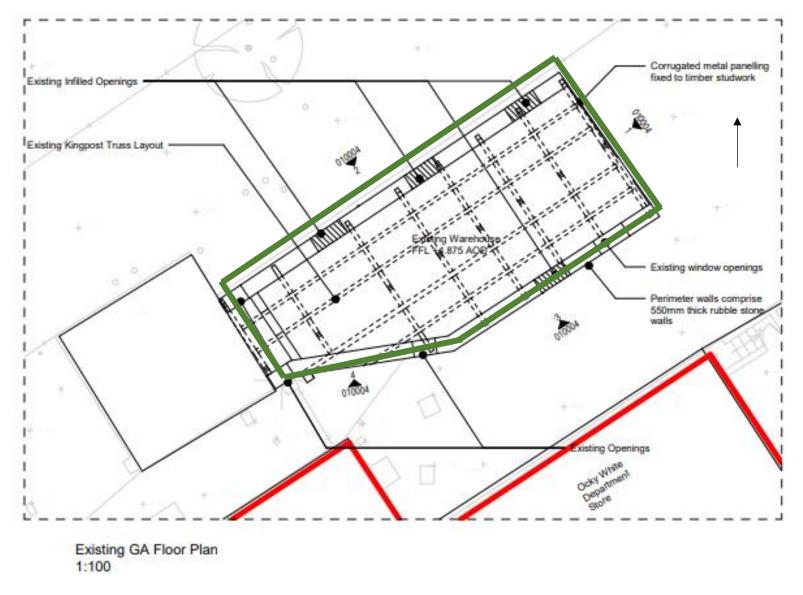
Floor plan of warehouse building (outlined in green). Ocky White department store can be seen to the south in red. Image supplied by client.
